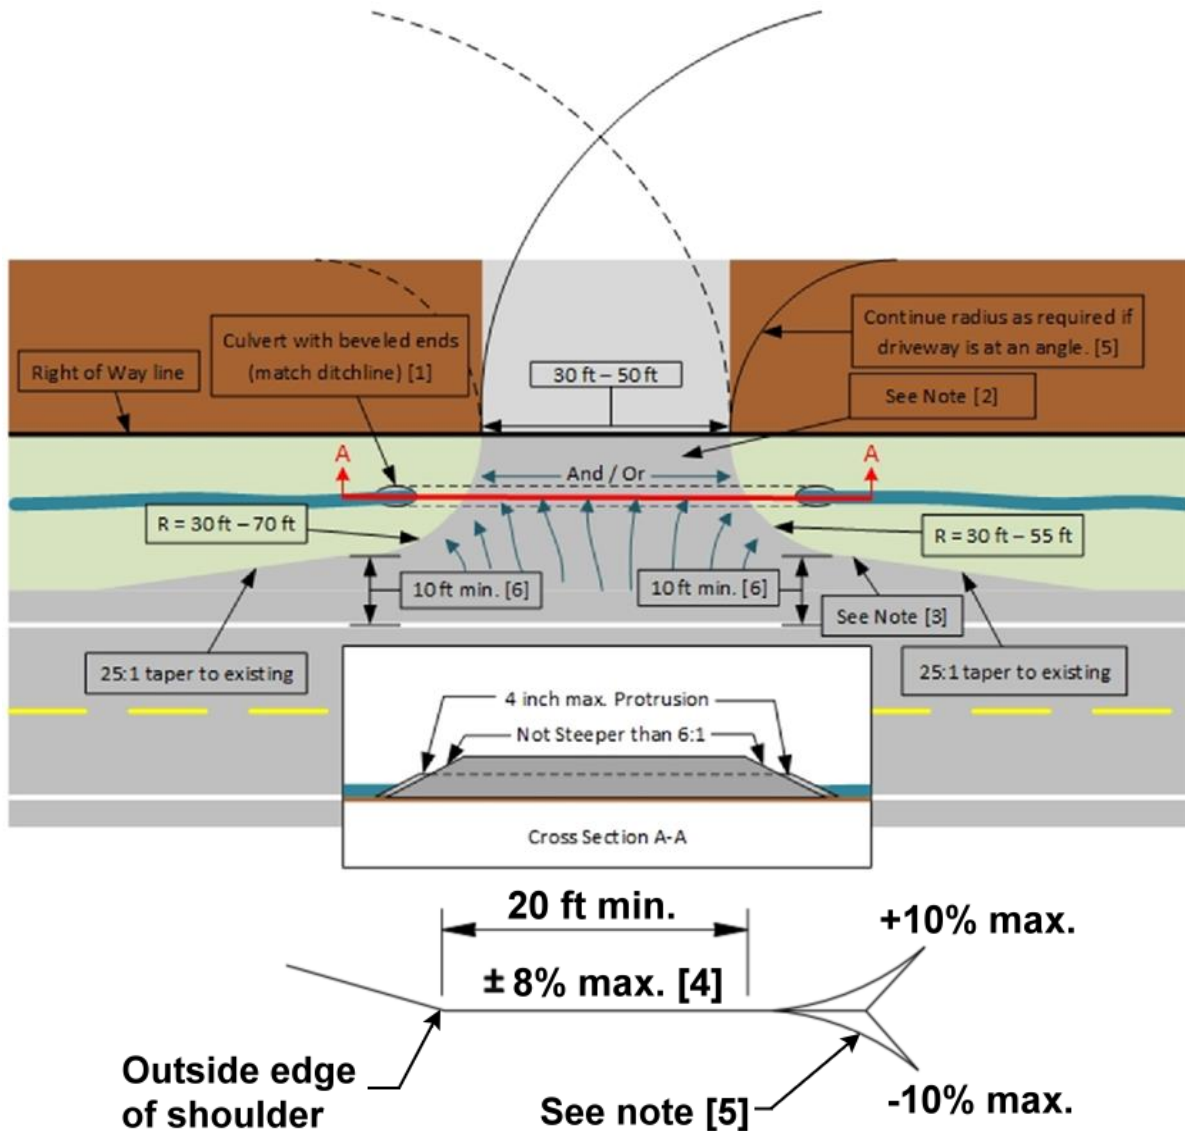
Driveway Design Template SU-30 and Smaller
